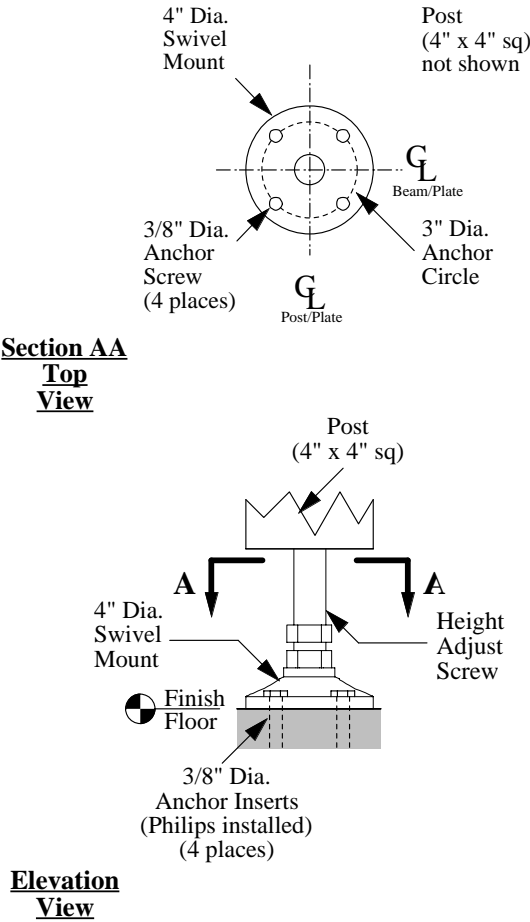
Skylight Anchor Plan, Y-Extension (short axis)
